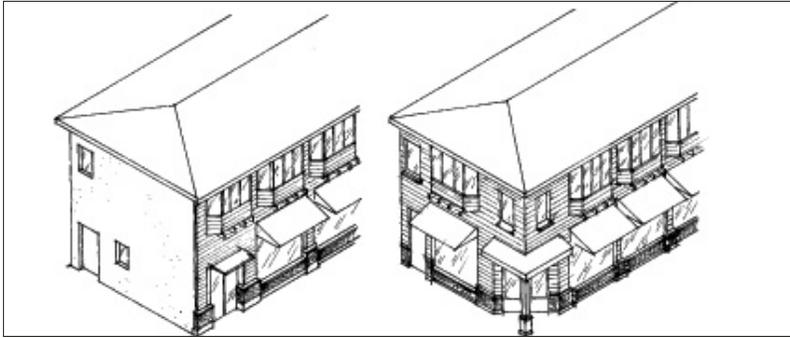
The continuity of façade materials at exposed building corner is essential to the side street.
